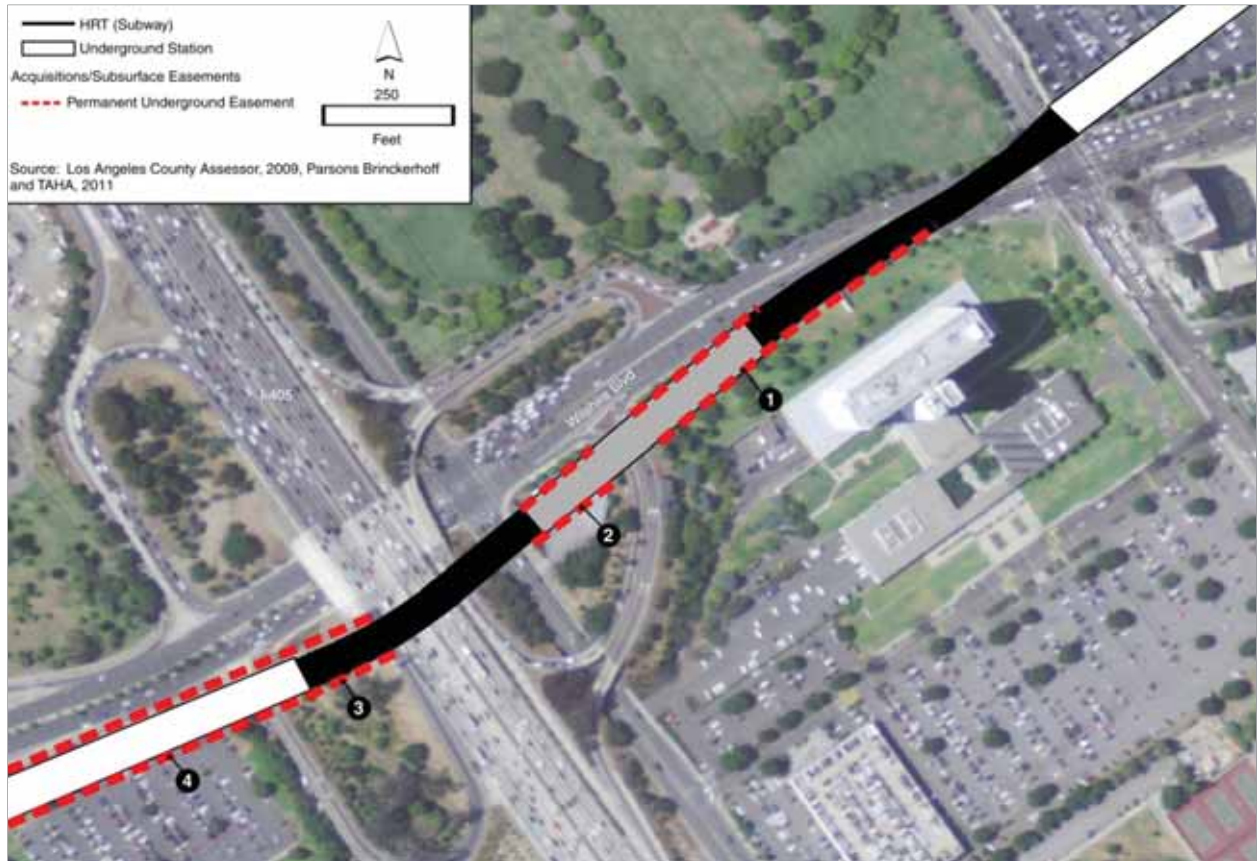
Westwood/UCLA On-Street Station to the VA Hospital North Station
